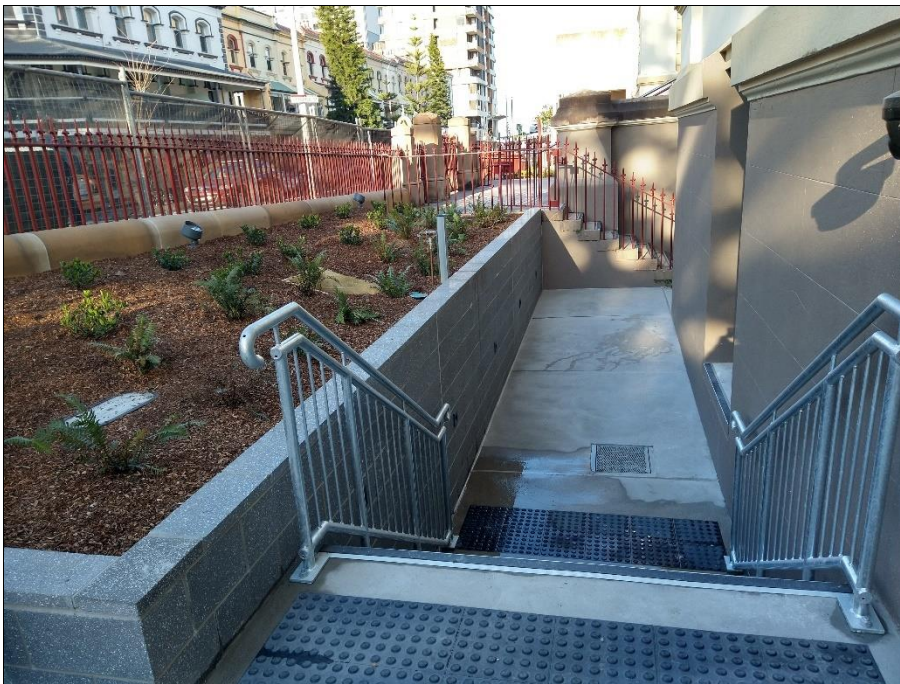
Looking east at garden bed and concrete footpath pavements along the northern side (front) of the central building. Mulch supplied from Oz LandscapeSupplies (20 August 2021)
